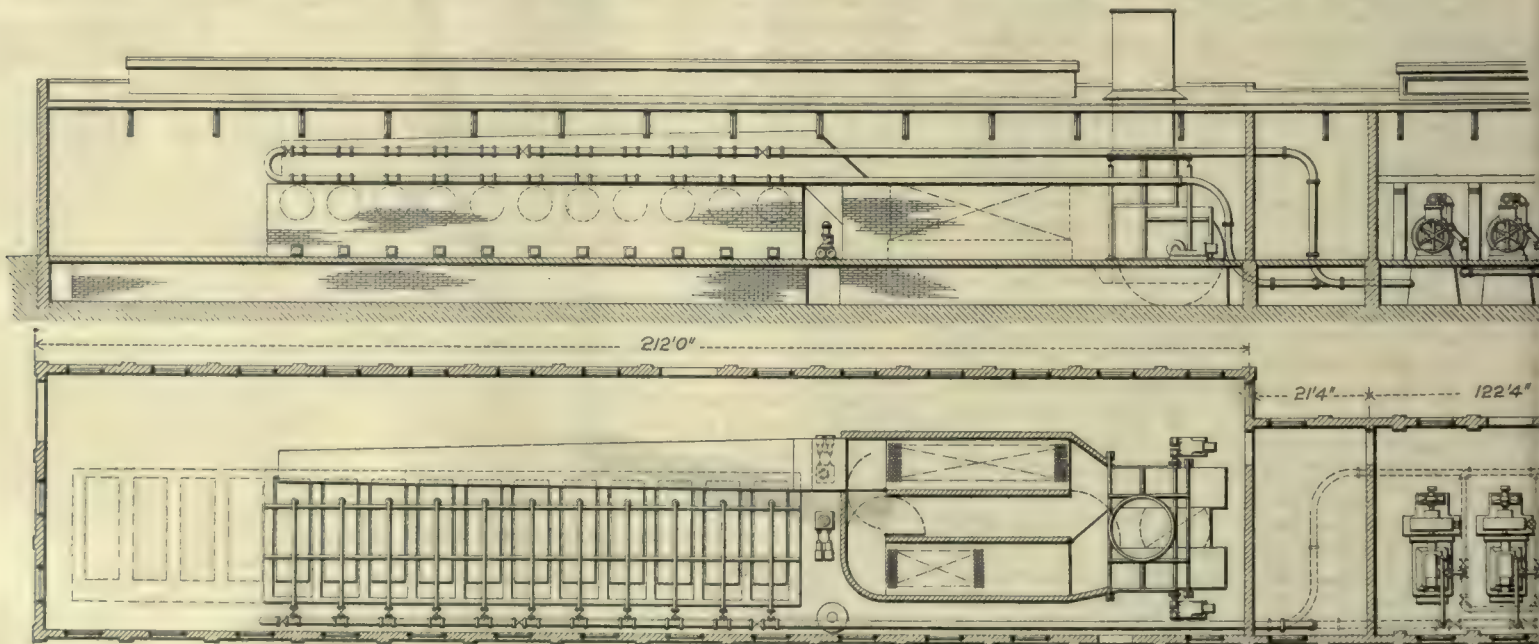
Plan and Longitudinal Section of Boiler Room.
